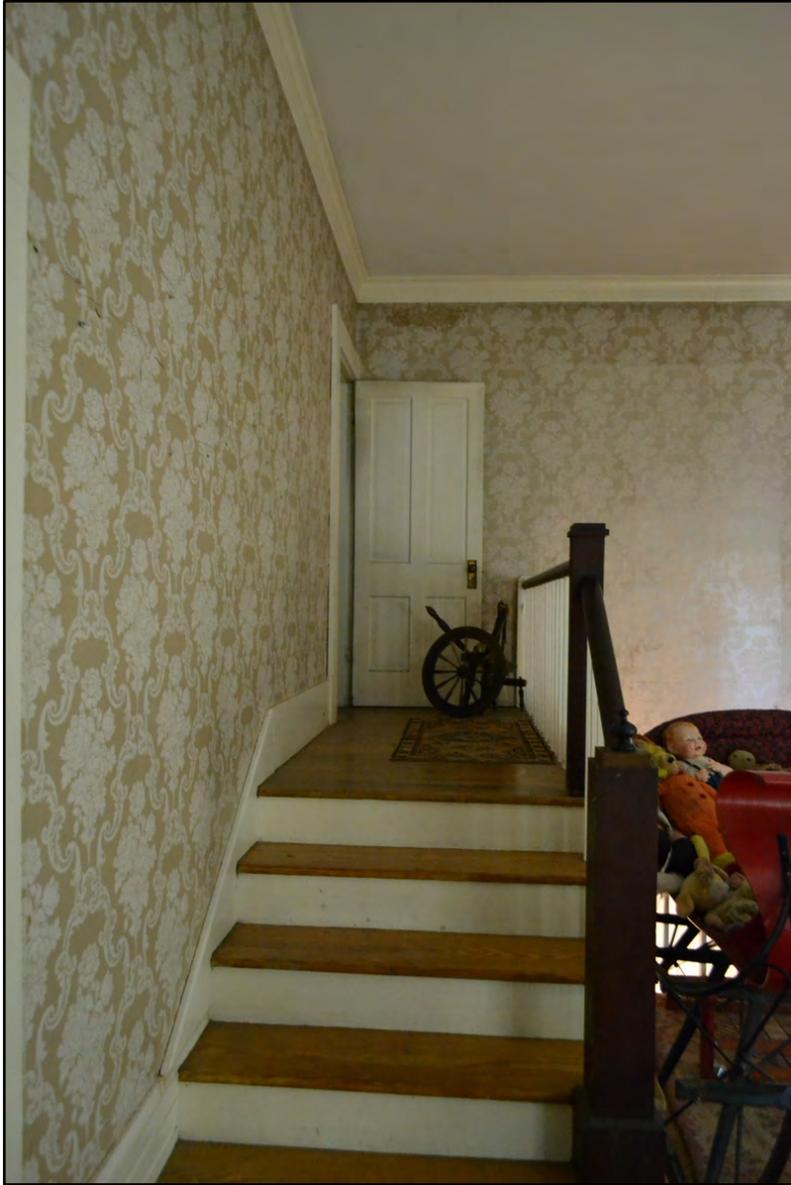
Stairs and landing leading to attic stairs, Room 7.
